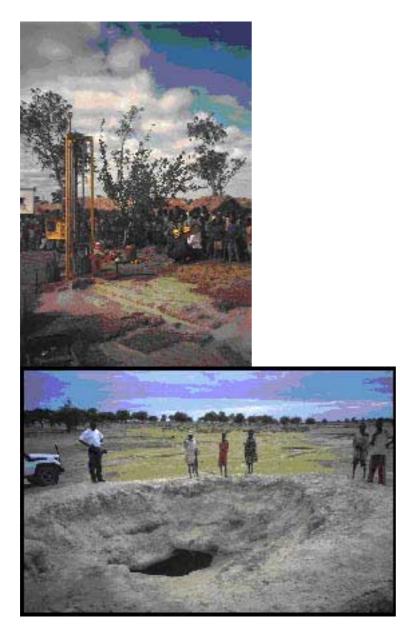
Drilling of a new well in Lombe (Malanje) Vissaca (Huila)
